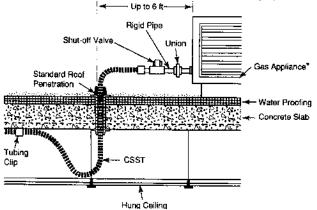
Short (1-6 foot) outdoor connection to roof mounted equipment
